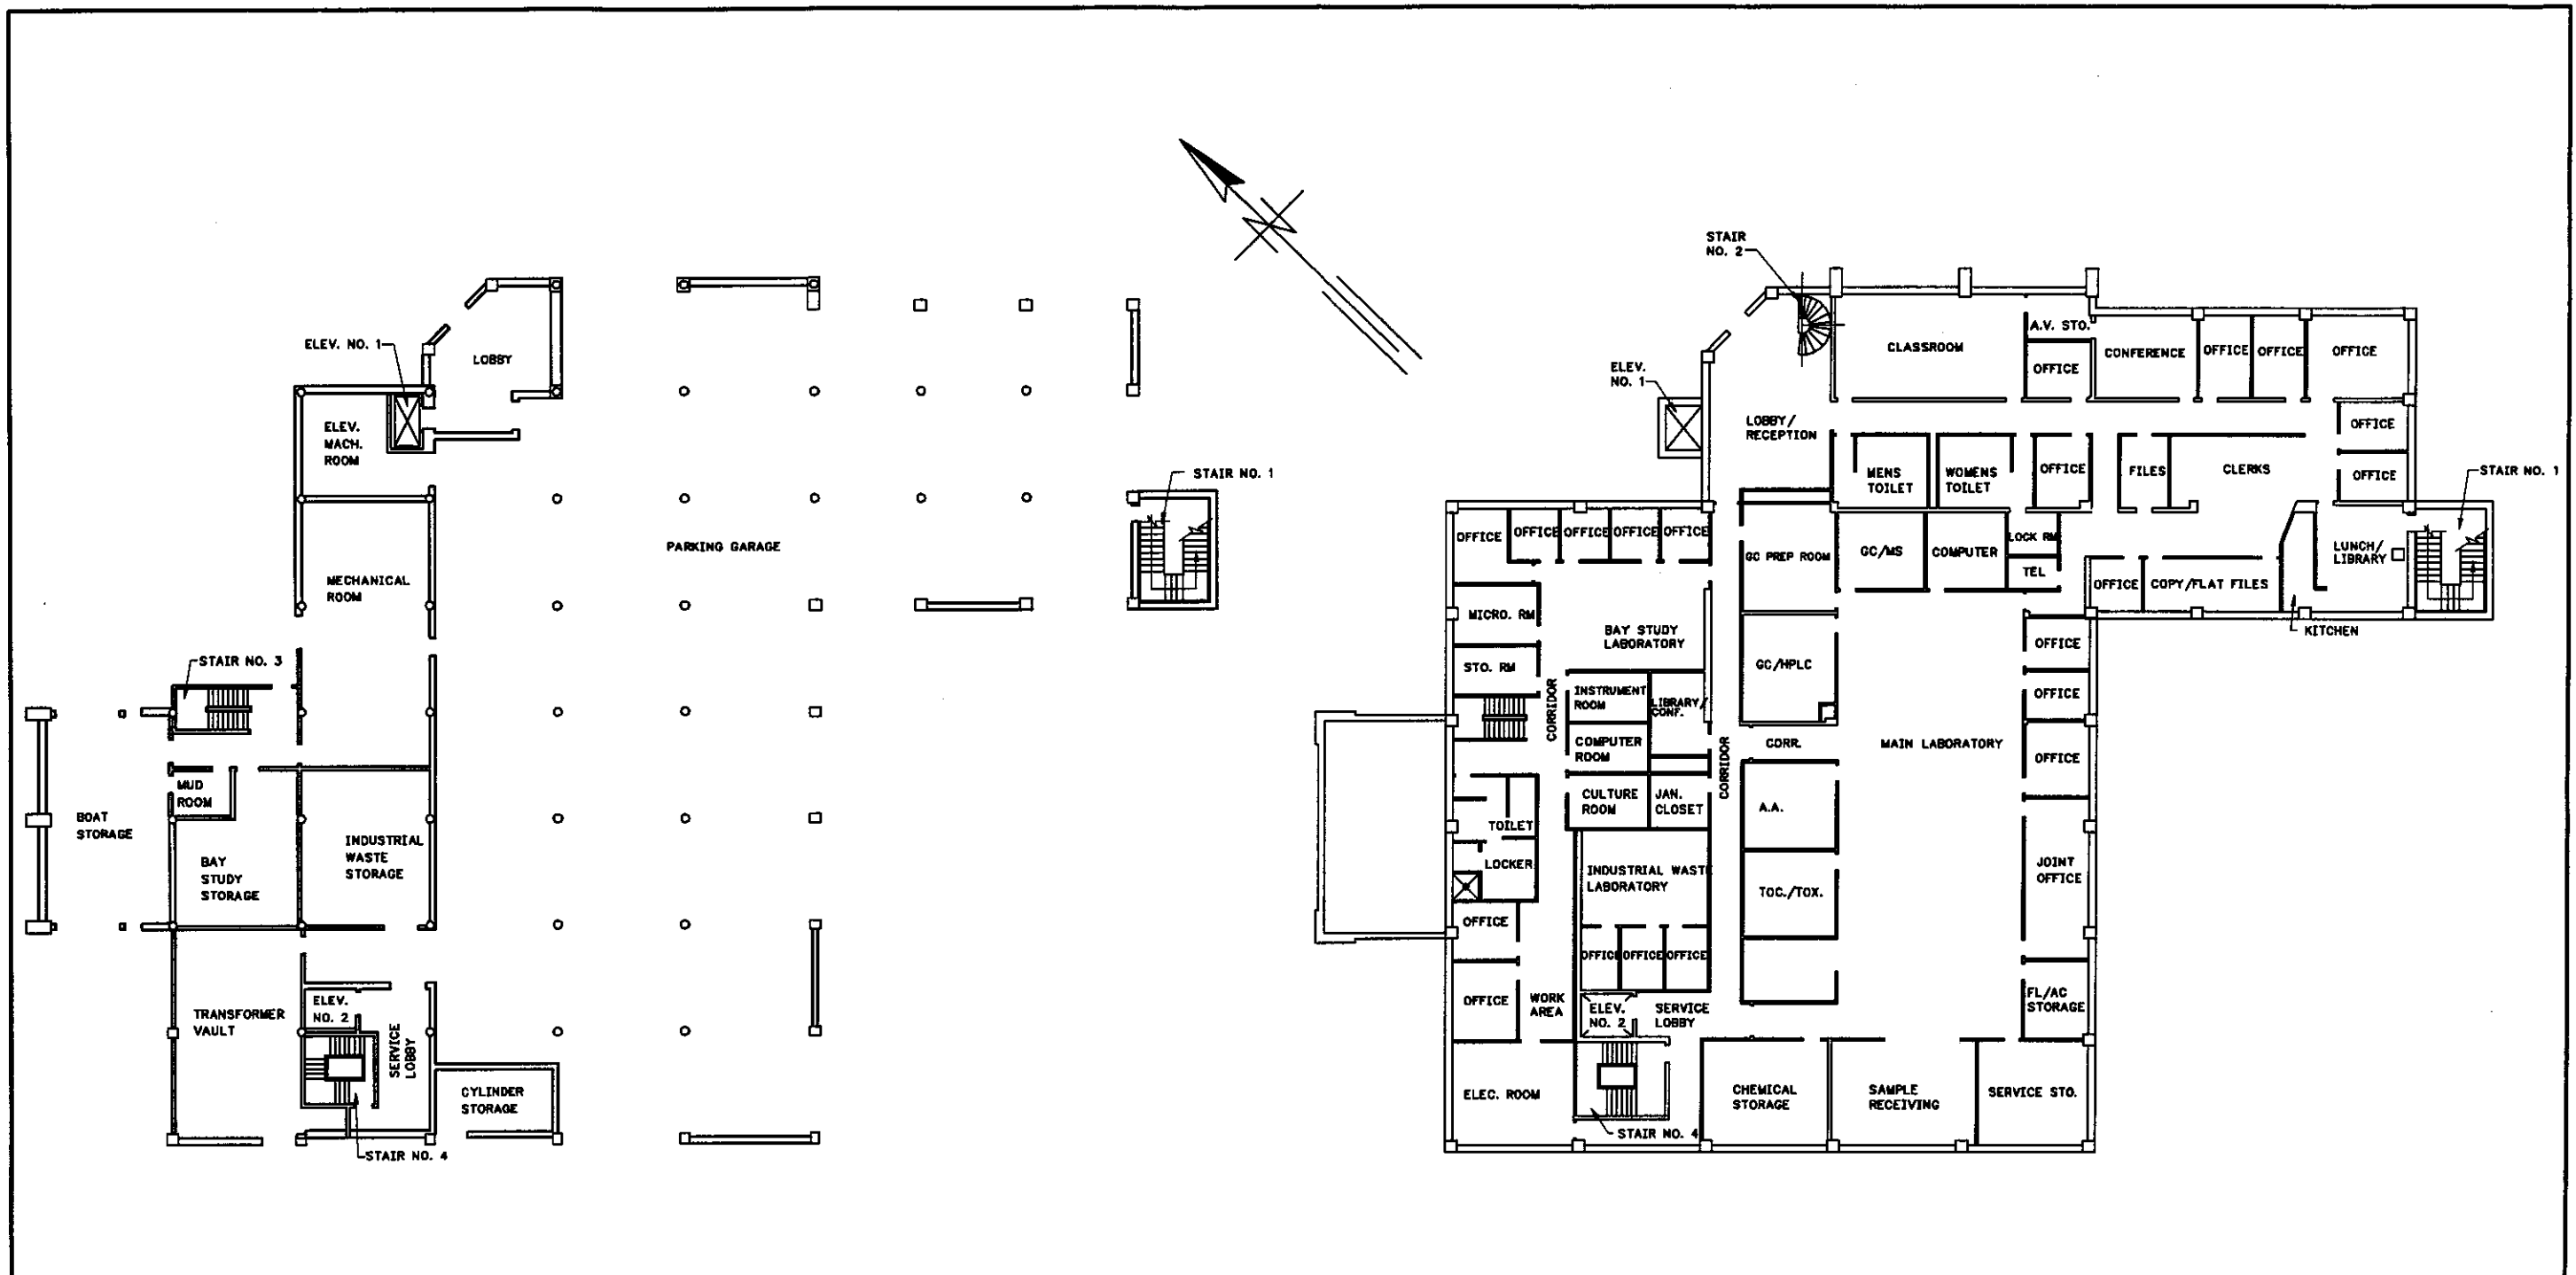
FIGURE III-AD-OMB-2 MAINTENANCE BUILDING PLAN
